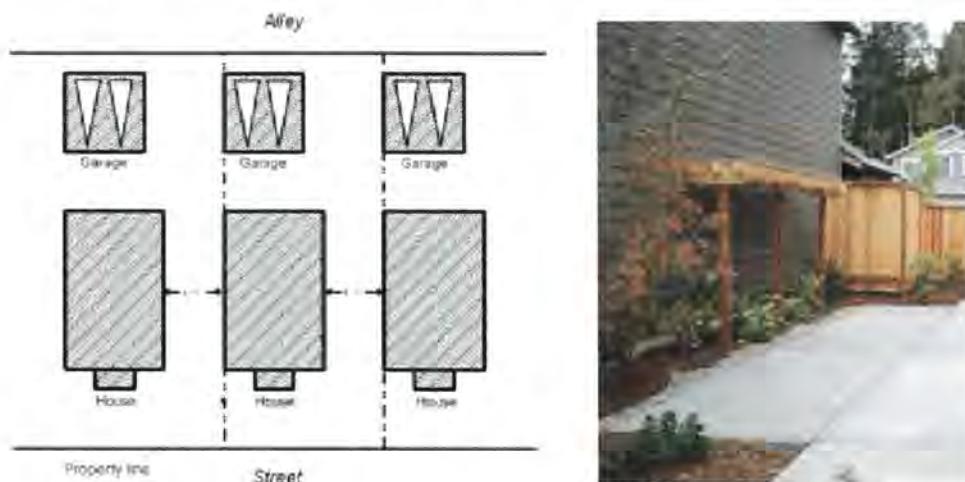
(A). Zero lot line layout example (left). The right image shows the side yard and privacy wall for a zero lot line house.
